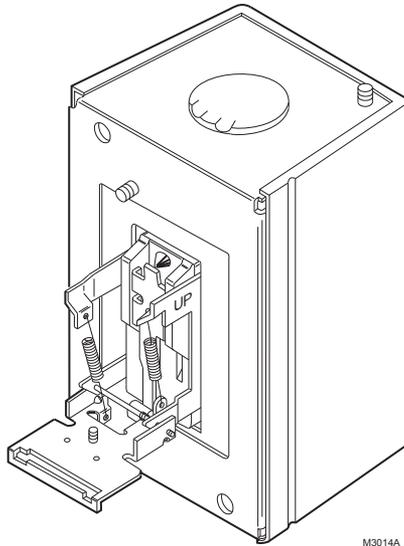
Adapting sail switch to air flow direction or mounting position.
